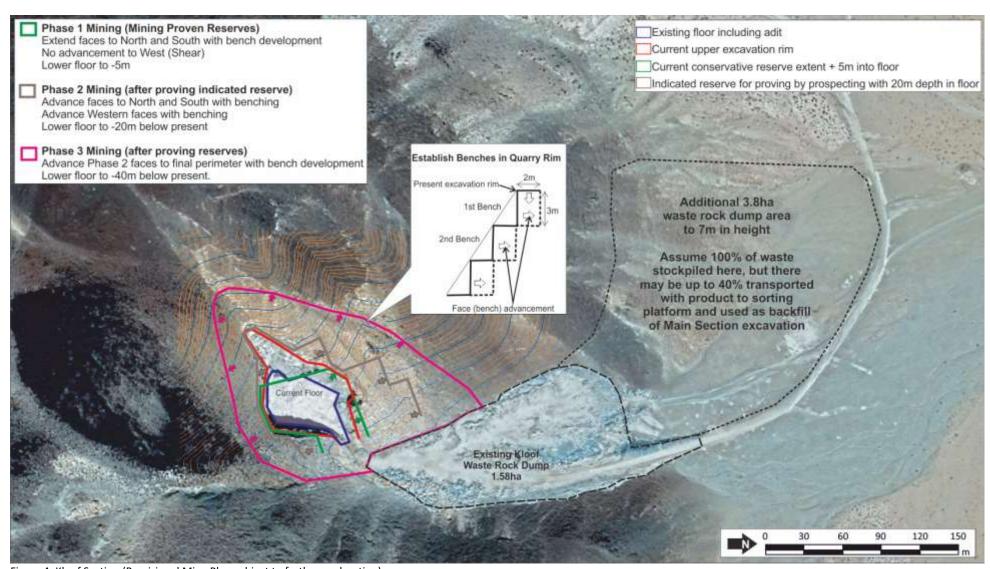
Kloof Section (Provisional Mine Plan subject to further exploration)
